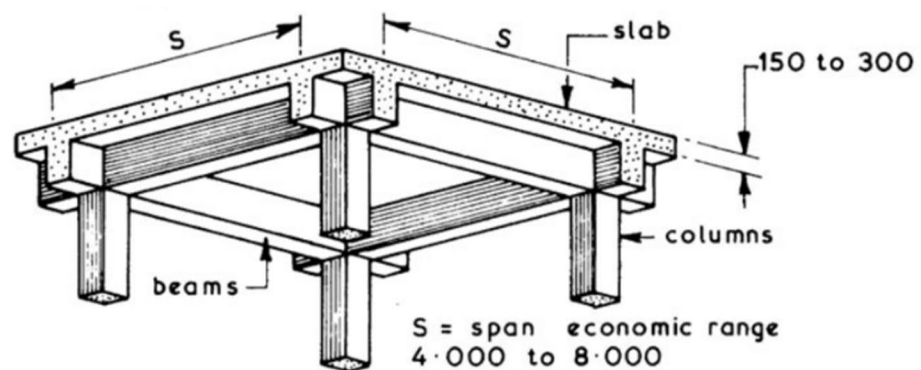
Two-way slab with beams (Chudley & Greeno, 2014, p. 784)
